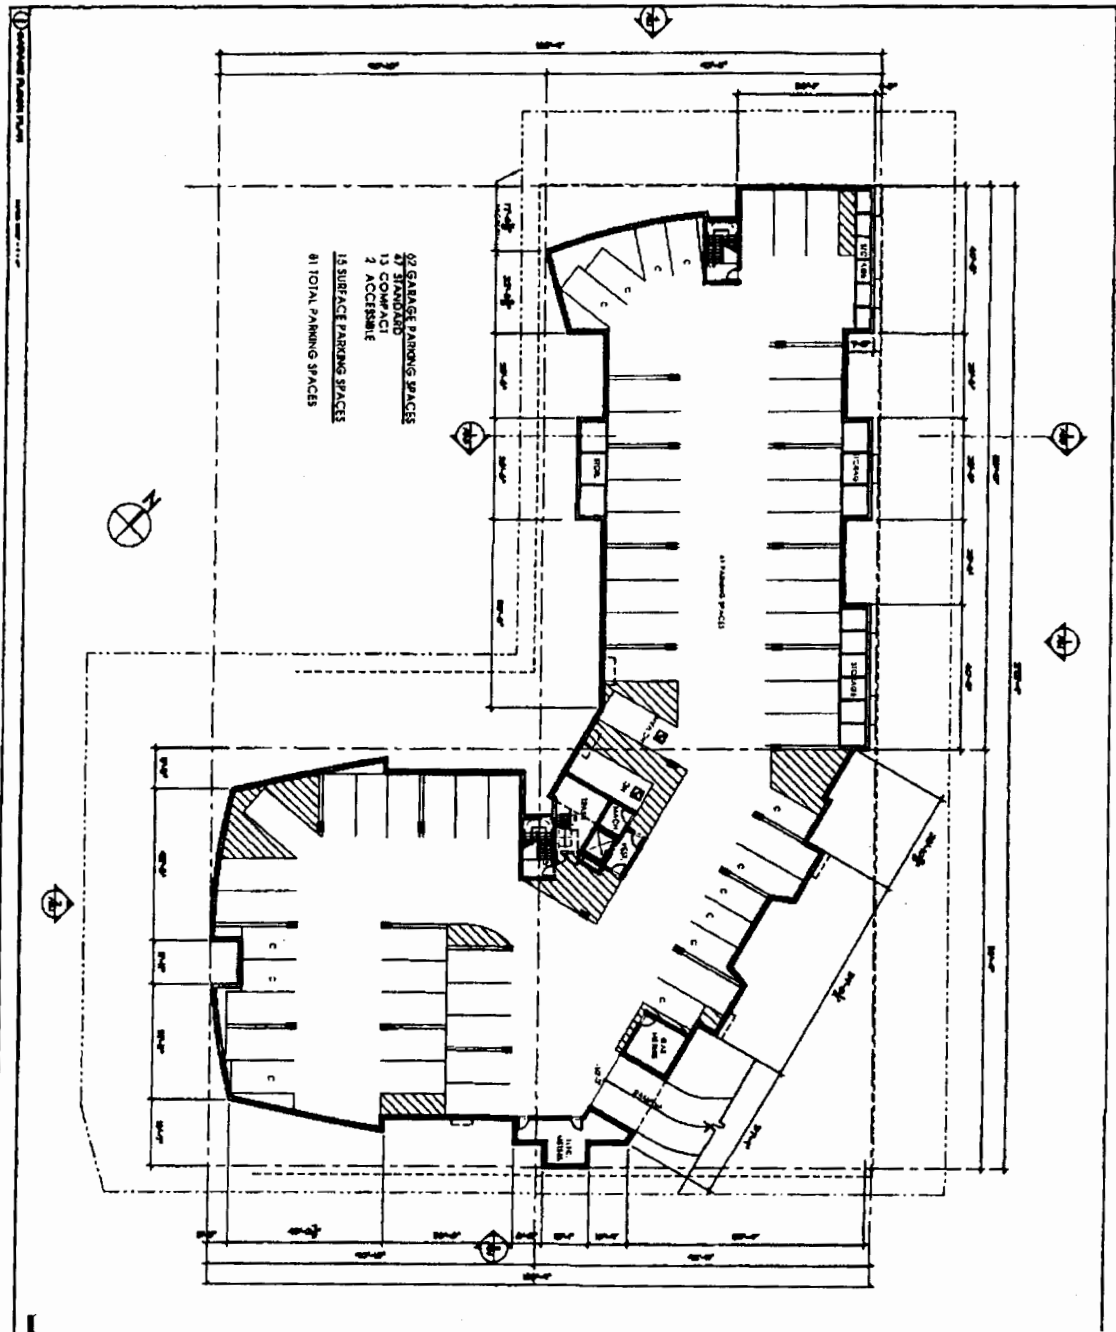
A. Proposed Costa Norte condominium complex underground garage floor plan (ib+a architecture, sheet A2.0). Figure greatly reduced. "A" Street is to the right. Access to the underground garage is from "A" Street at the southeast corner of property (lower right hand corner of figure; see "RAMP UP").
